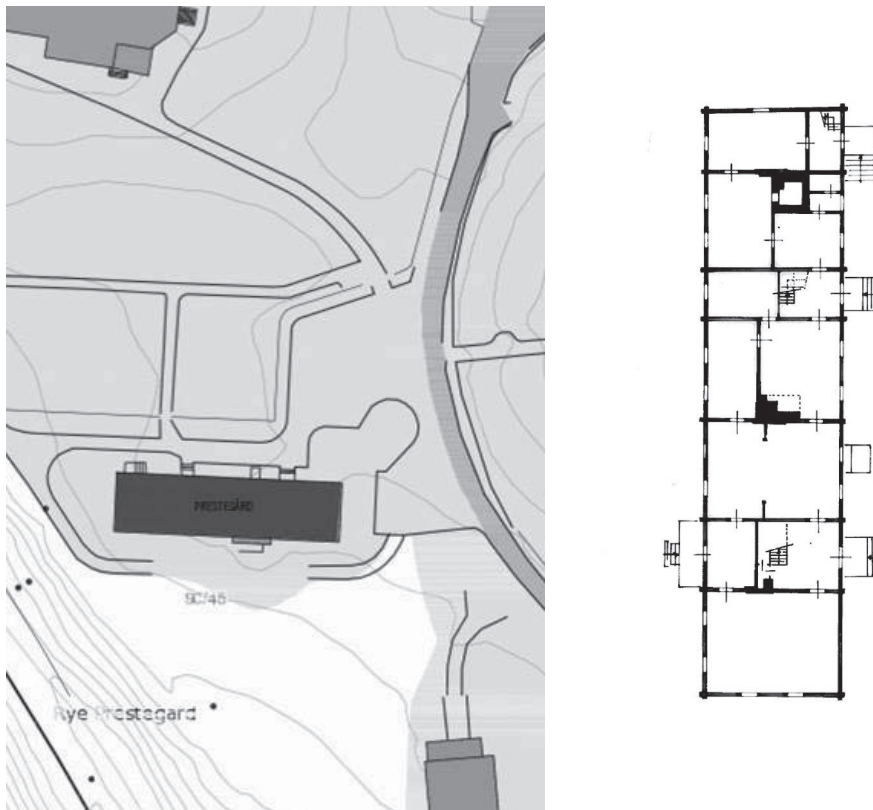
Melhus vicarage, site plan (left) and floor plan (right), (August Schmidt)
